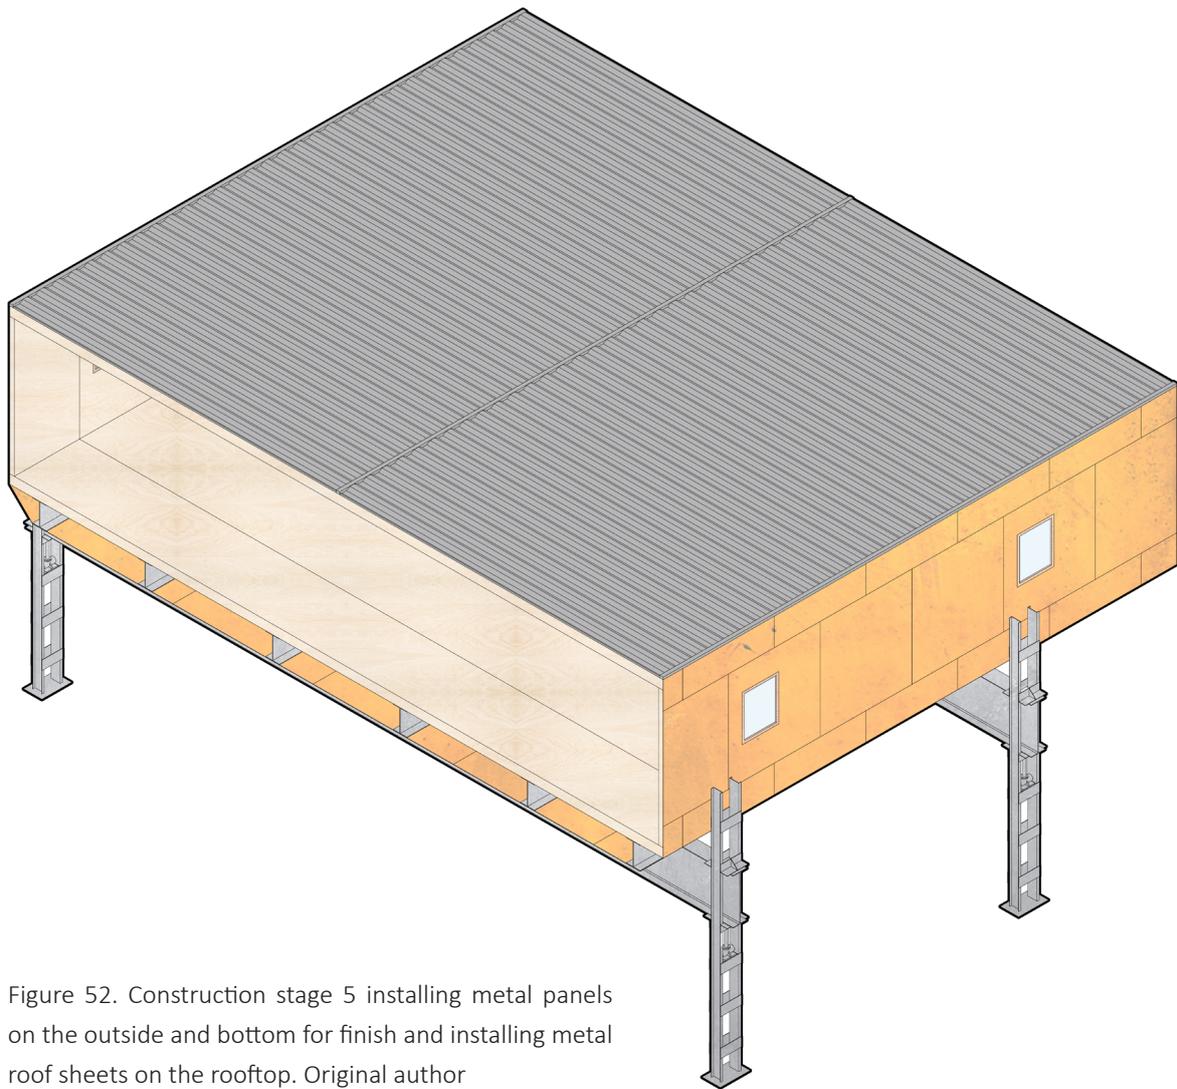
Construction stage 5 installing metal panels on the outside and bottom for finish and installing metal roof sheets on the rooftop. Original author
